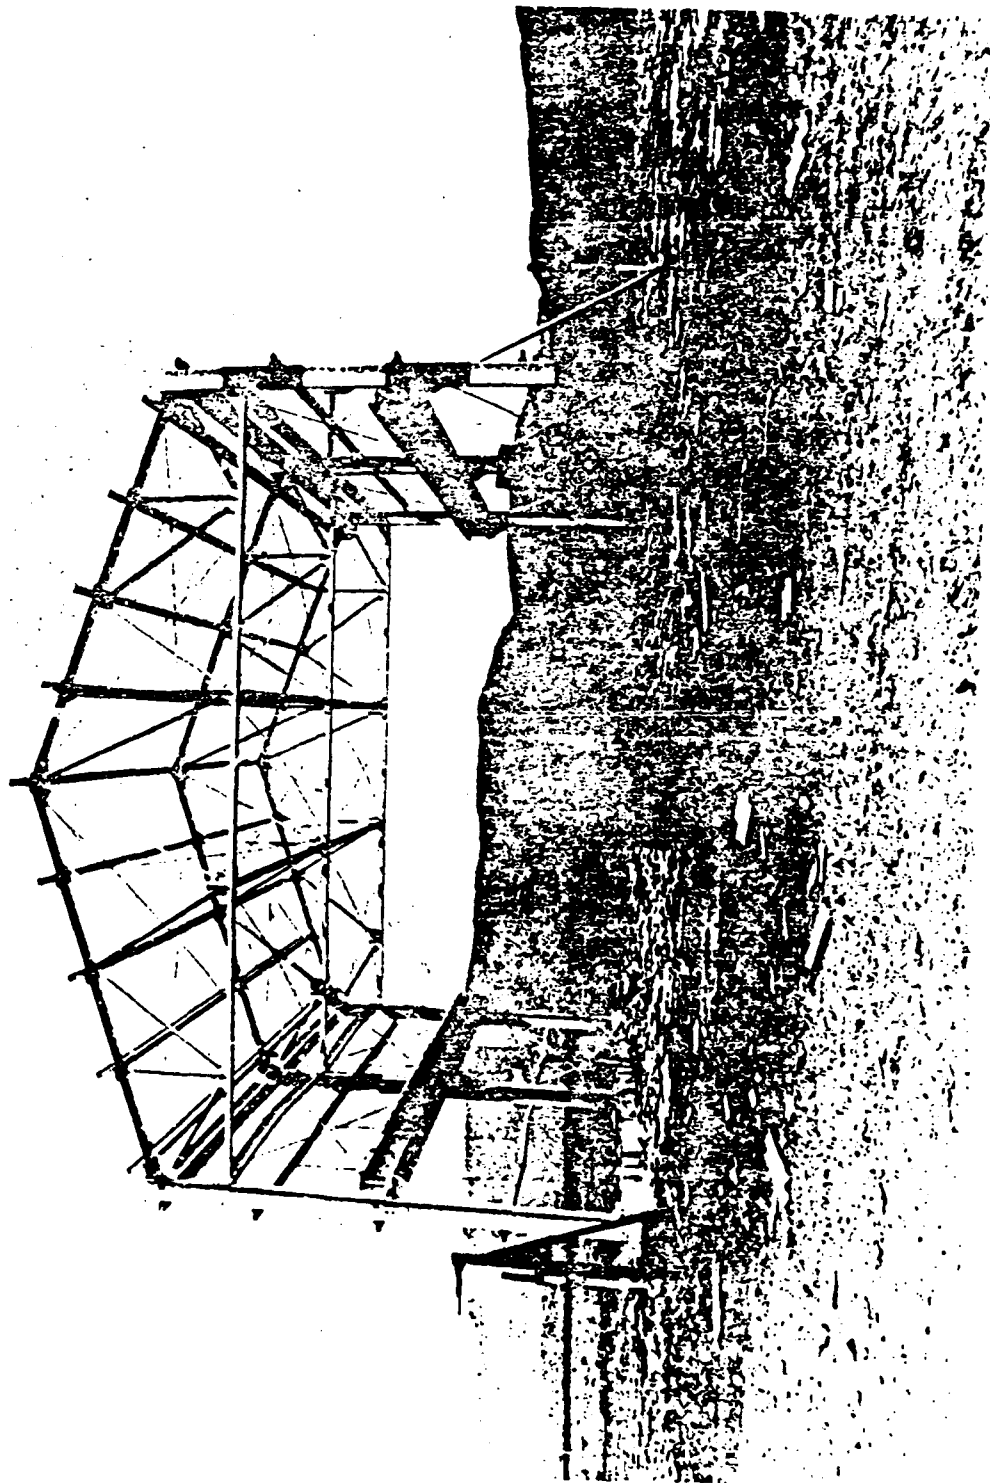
Full size steel frame building (postshot) (WES 26u2).
